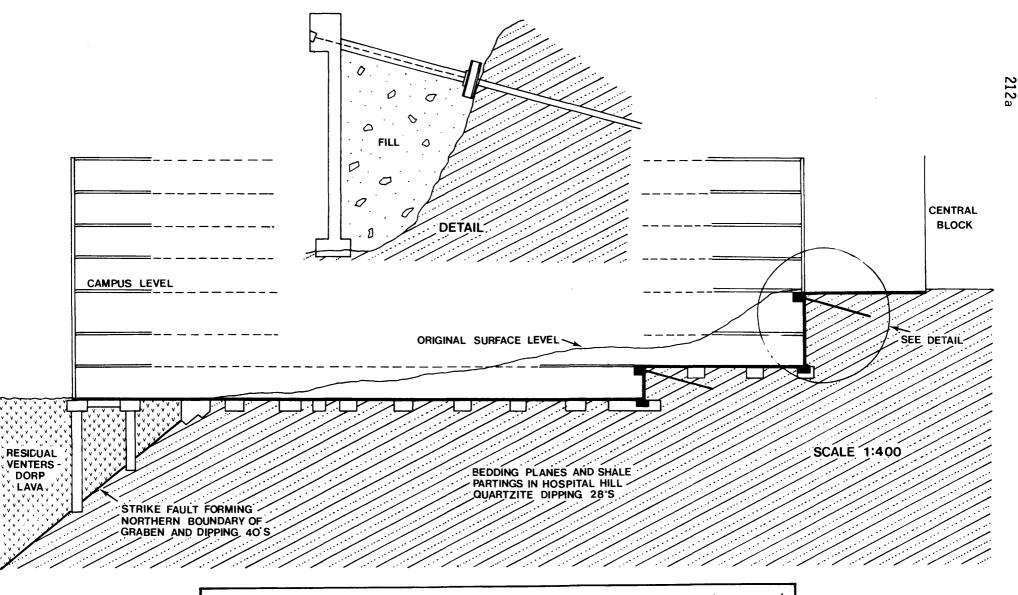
/10 : North-south cross-section below Senate House, University of the Witwatersrand
